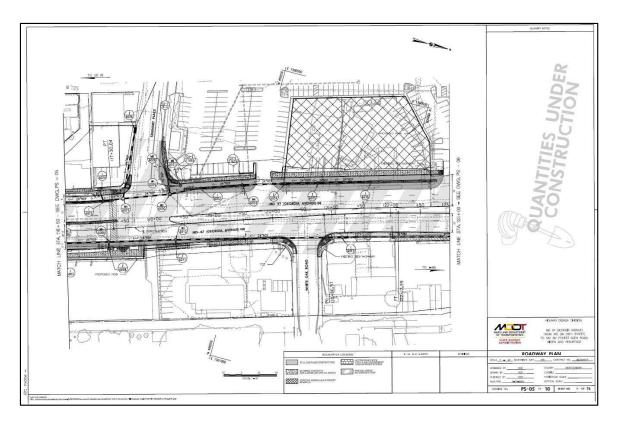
Plan View – Georgia Avenue at Seminary Place and White Oak Road
